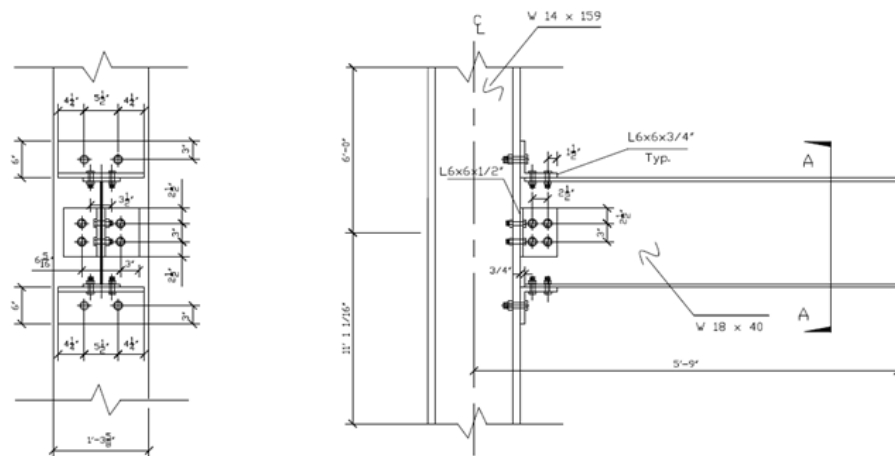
Elevation view of the physical specimen with its final dimensions
